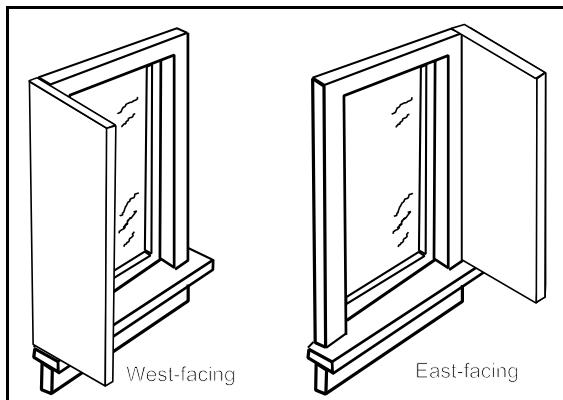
Wing walls for shading windows from low sun in summer, without greatly blocking the view.
